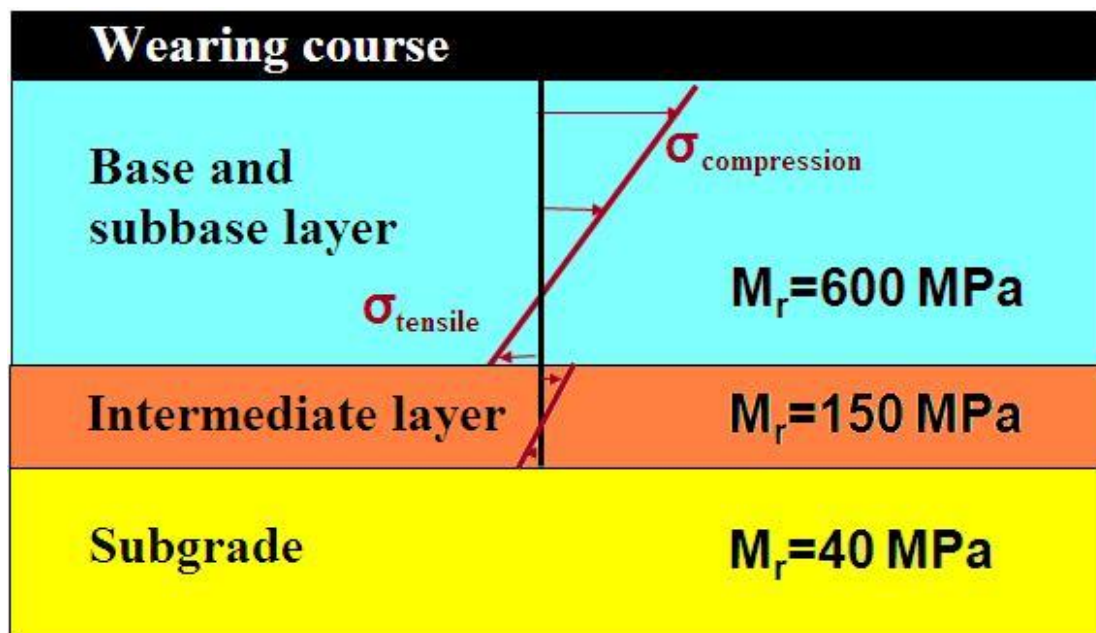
Stresses occurring in pavement construction after applying the intermediate layer (Huvstig 2009)
